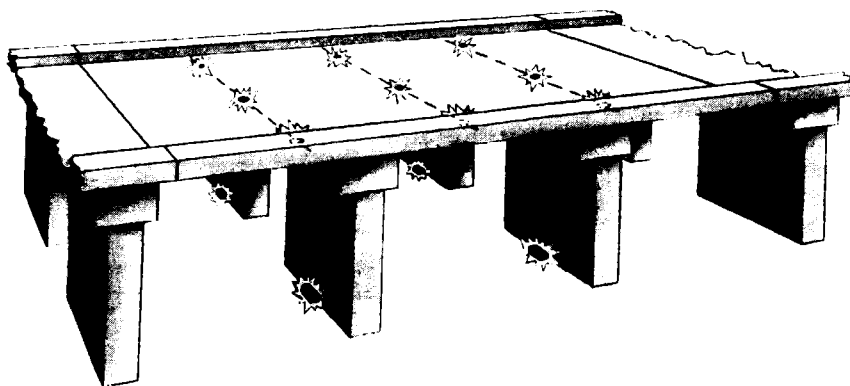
Demolition of concrete cantilever bridge without suspended span.
